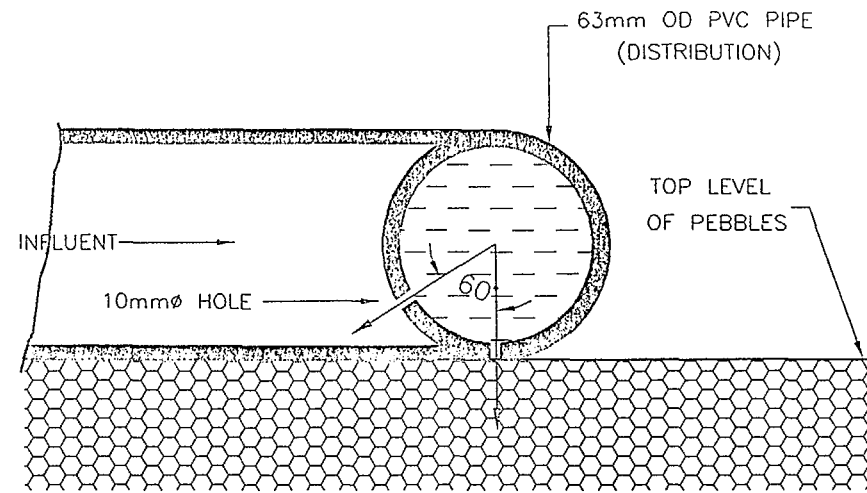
B DETAILS OF INLET PIPE AT TOP OF PEBBLES
